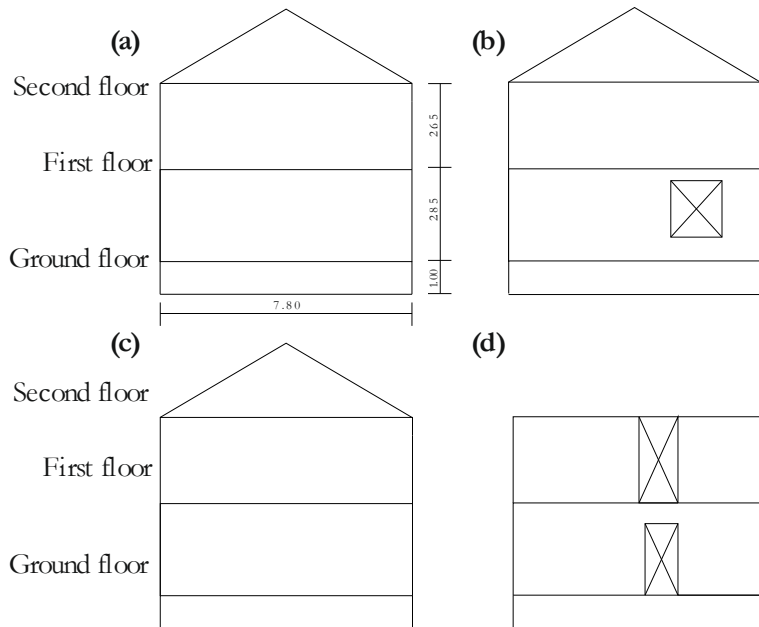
Geometry of the walls disposed along the Y-direction: external walls (a-b); unit partition wall (c), and internal wall of each unit(d).
